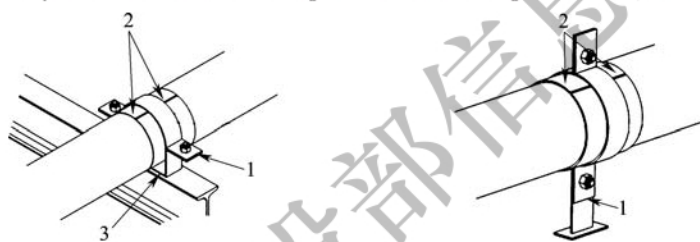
Pipe clamps and pipe sleeves of anchors
